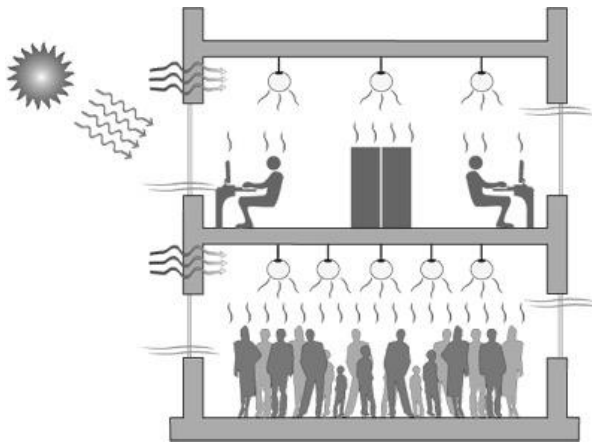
External and internal heat loads acting on a building. External loads are solar irradiance; internal loads are heat emitted by occupants and equipment. (Source: Whole building design guide, National institute of building sciences, Washington DC)
